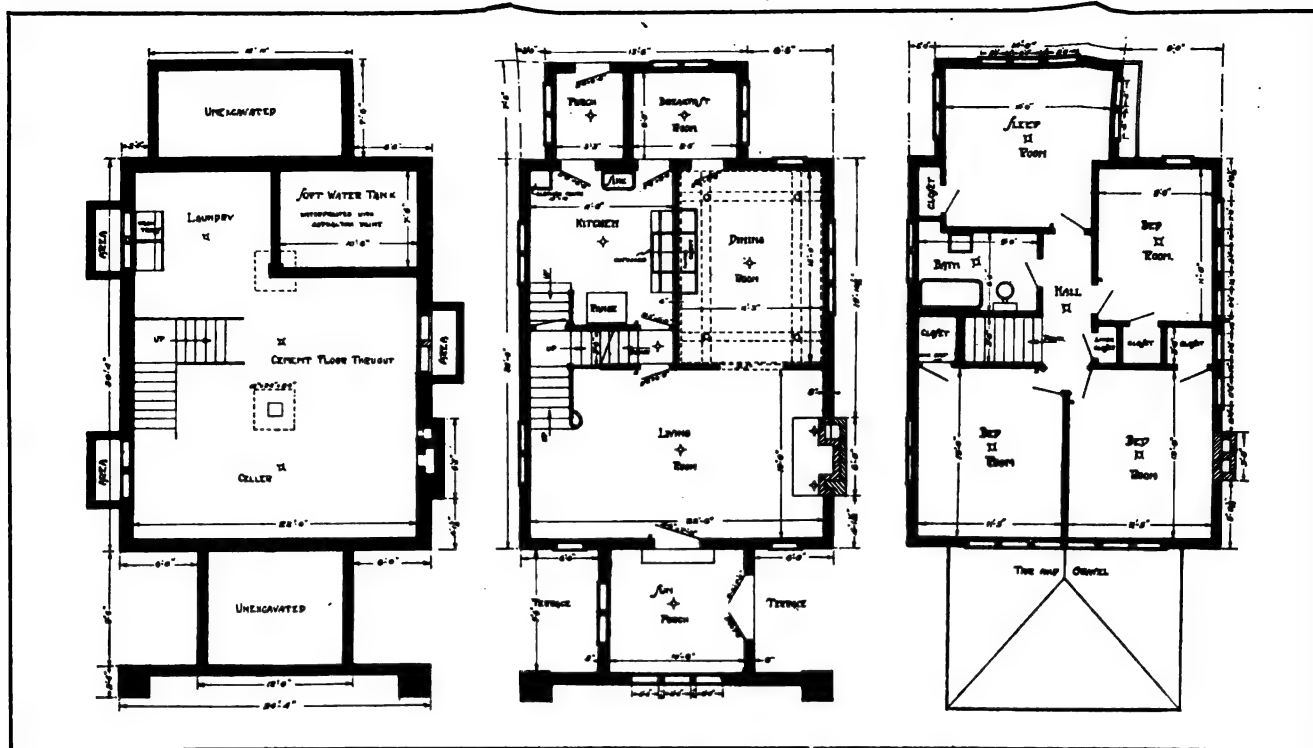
FLOOR PLANS OF THE SASKATOON COLD PROOF HOUSE
